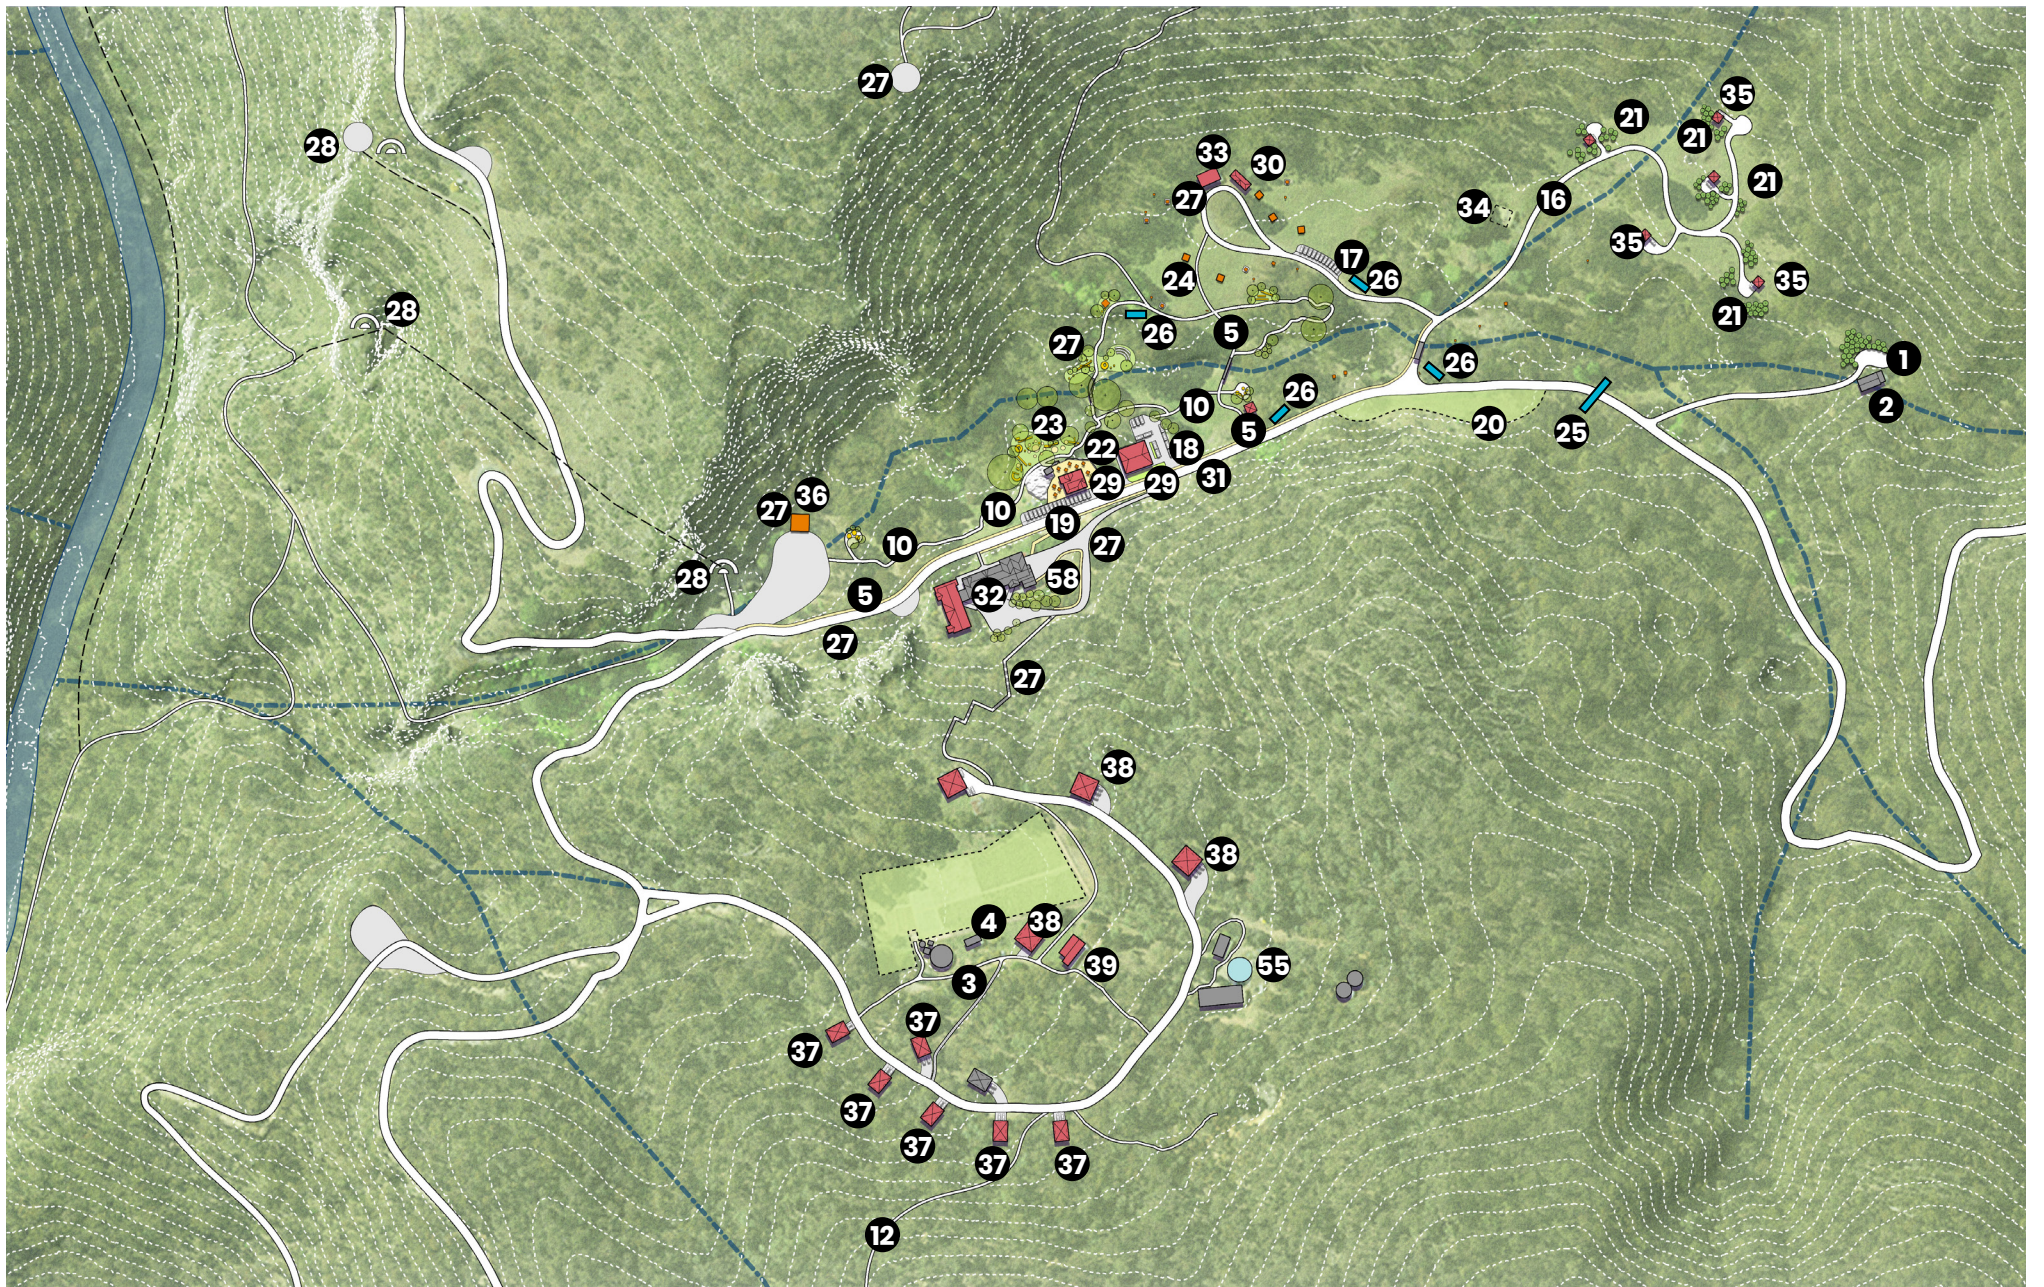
Facilities and infrastructure masterplan (JPW)
